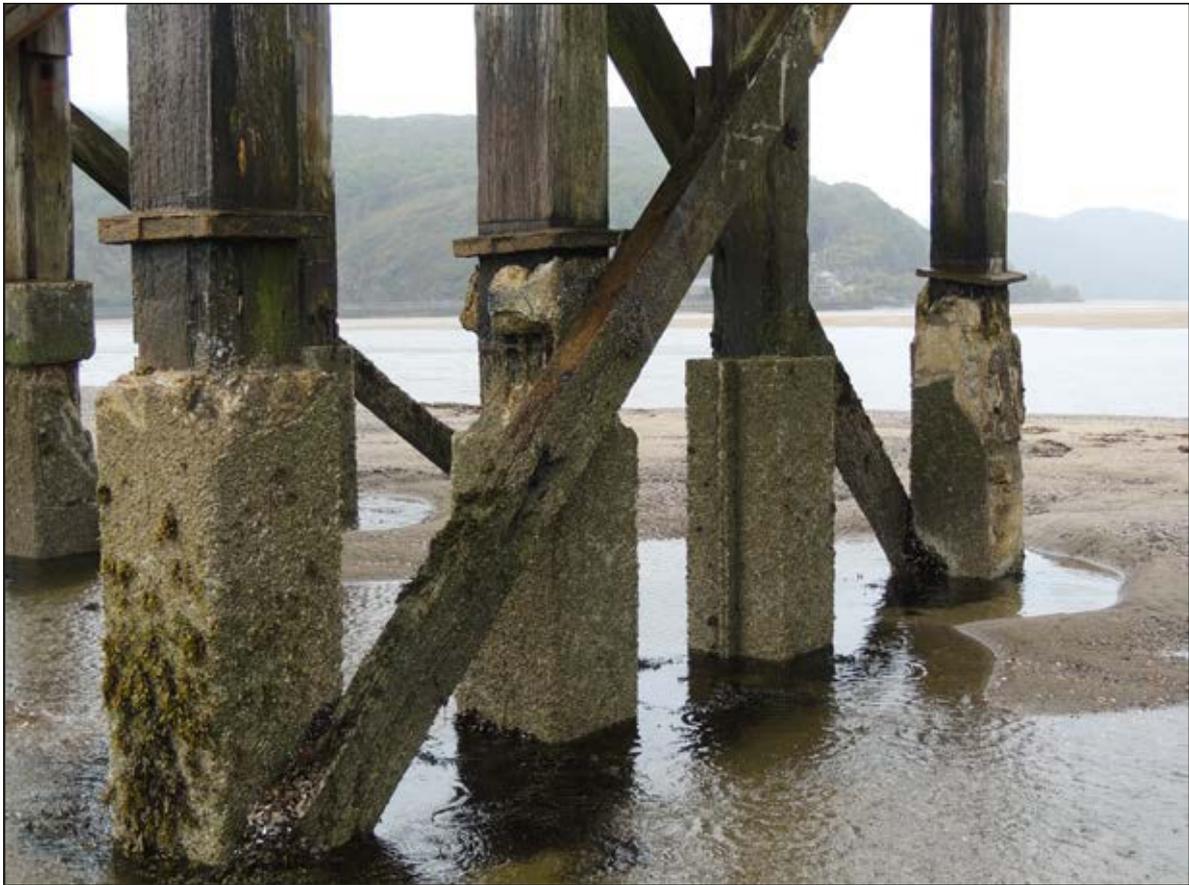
N facing shot of trestle 39 showing erosion of verticle piles and concrete pile casing.
